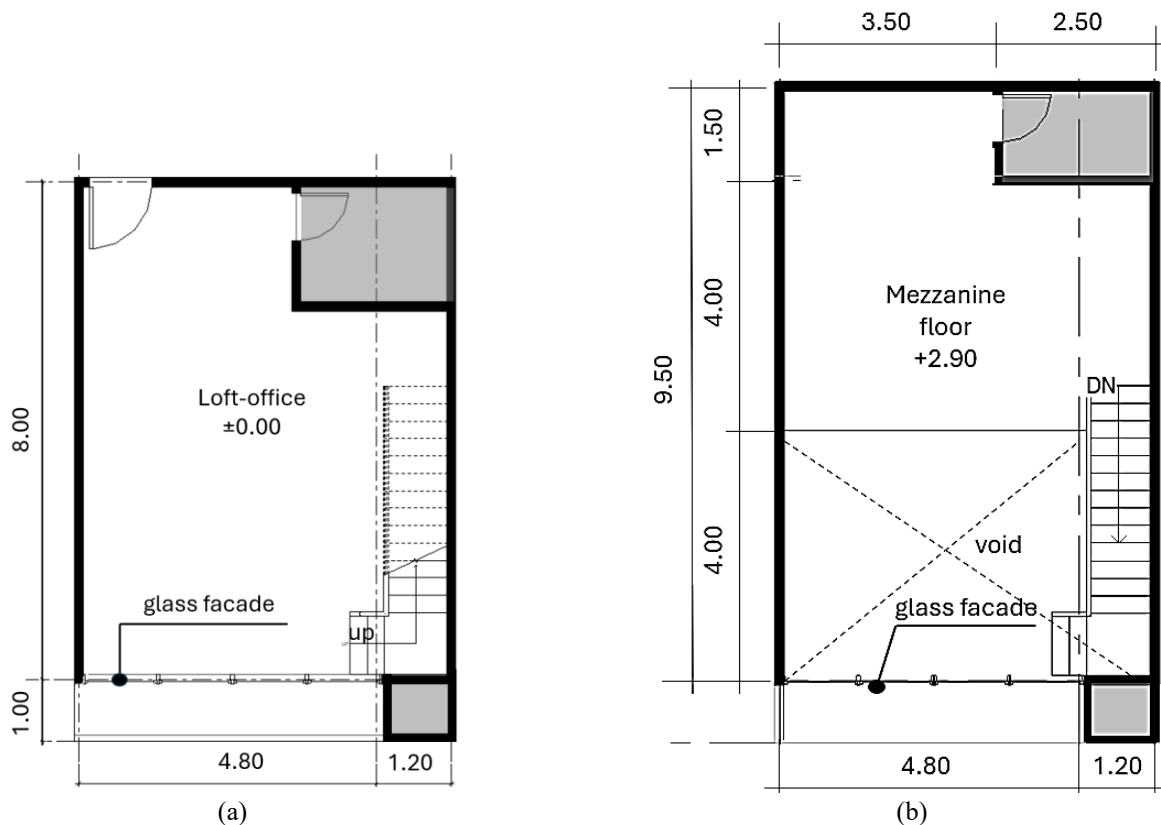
Loft Office Plan (a) 1st Floor (B) Mezzanine Floor
